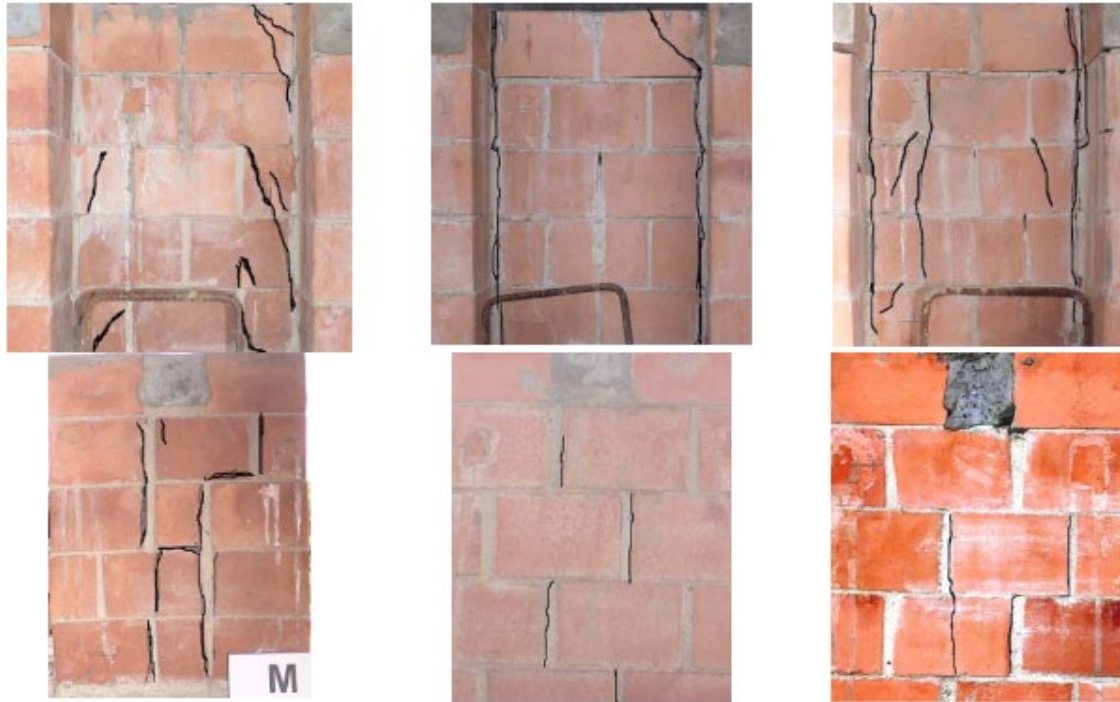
Comparison of typical failure patterns: a) Running bond (RB); b) Stack bond connected by steel trusses (SBT); c) Stack bond connected by steel U-staples (SBS)
